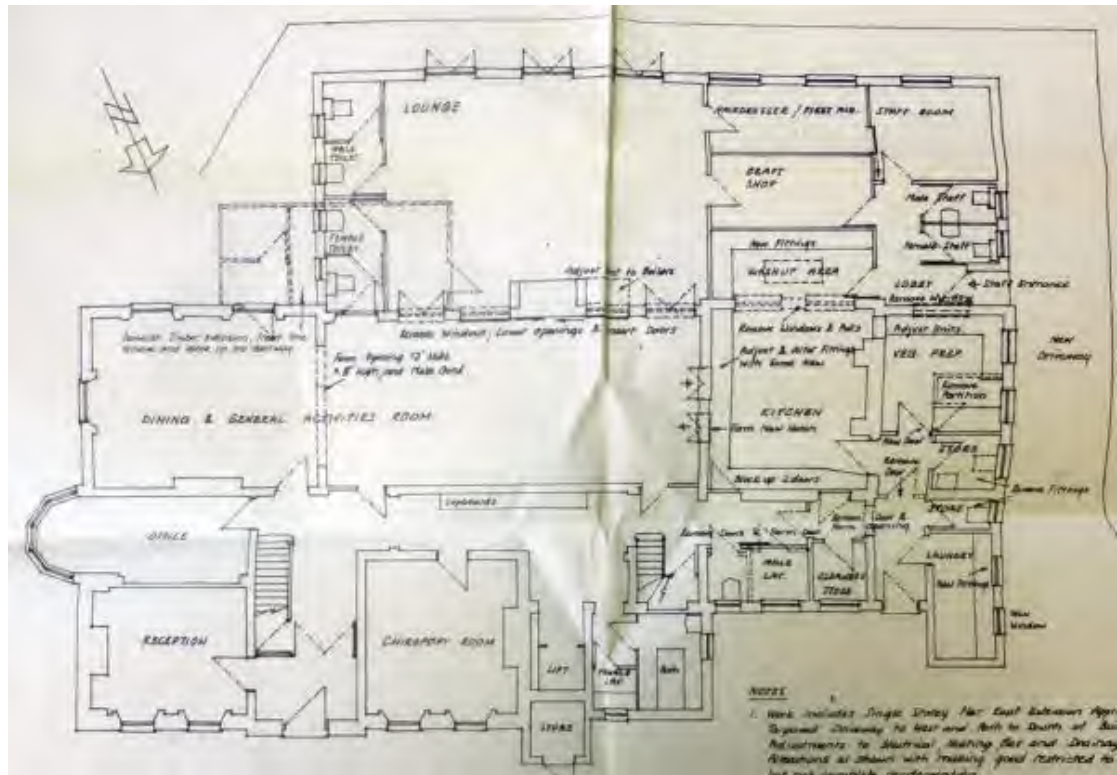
Floor plan of 1980 showing later alterations to historic fabric.
